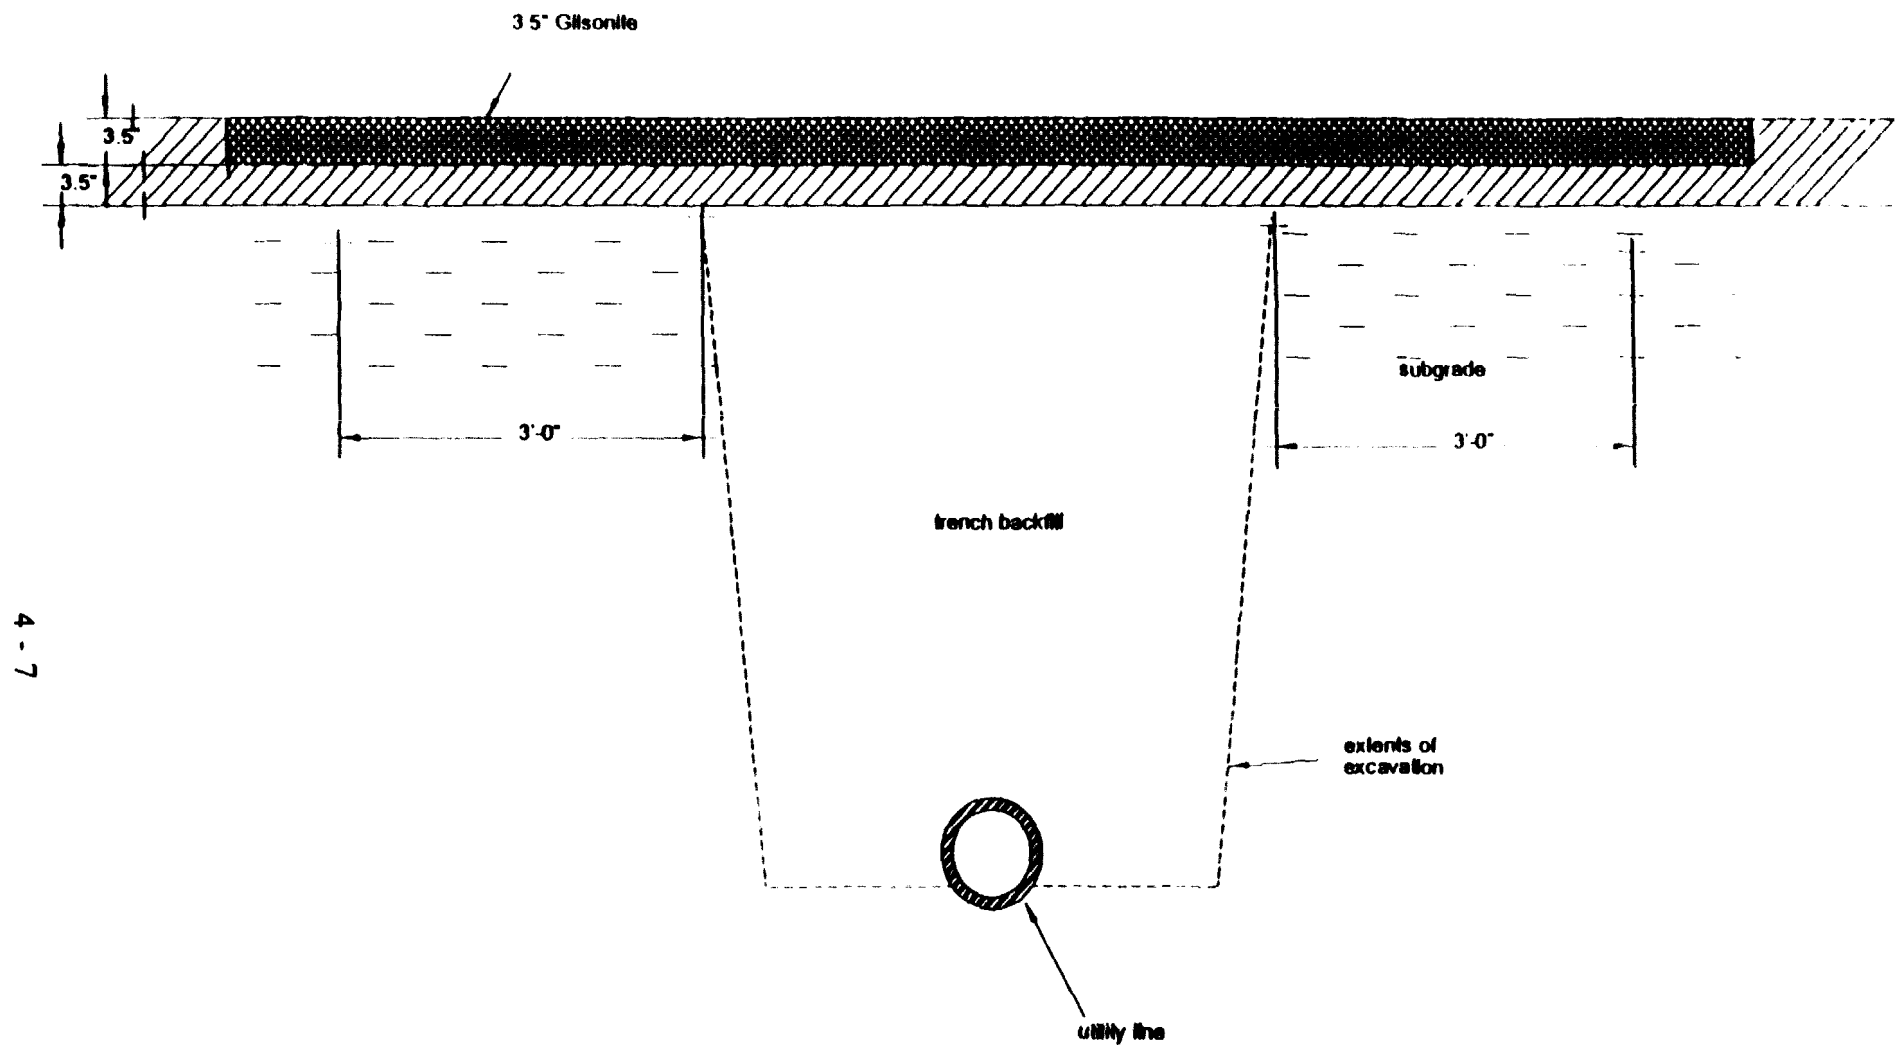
Pavement Strengthening by Replacing a 3.5 in. Thick Portion of AC Pavement with 3.5 in. Thick Gilsonite Asphalt Pad - Scheme 2
